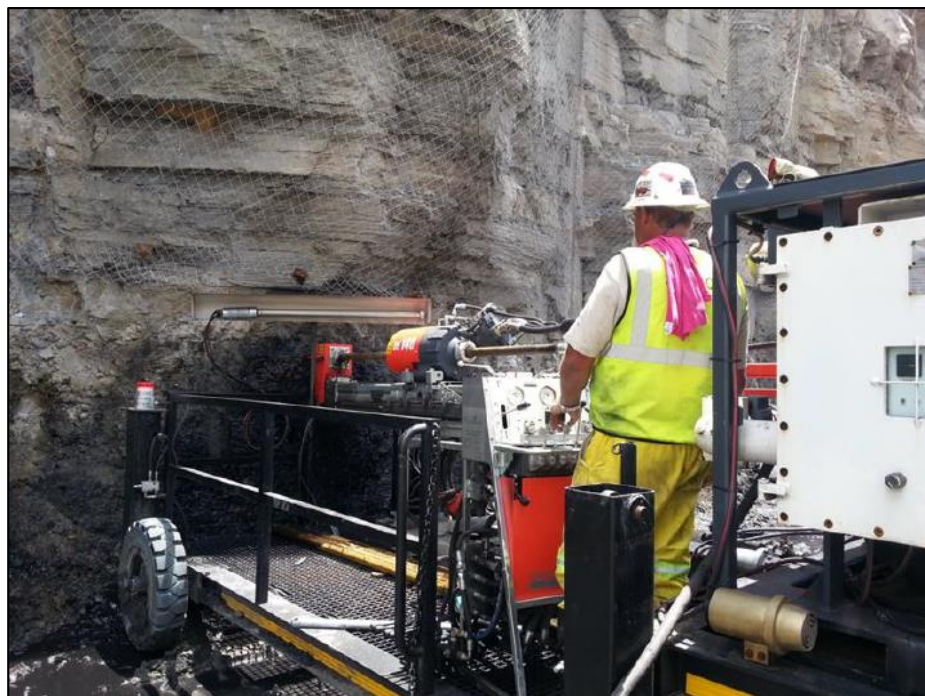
15m length horizontal hole pre-drilling using a trailer mounted Atlas Copco Rotary drilling machine
